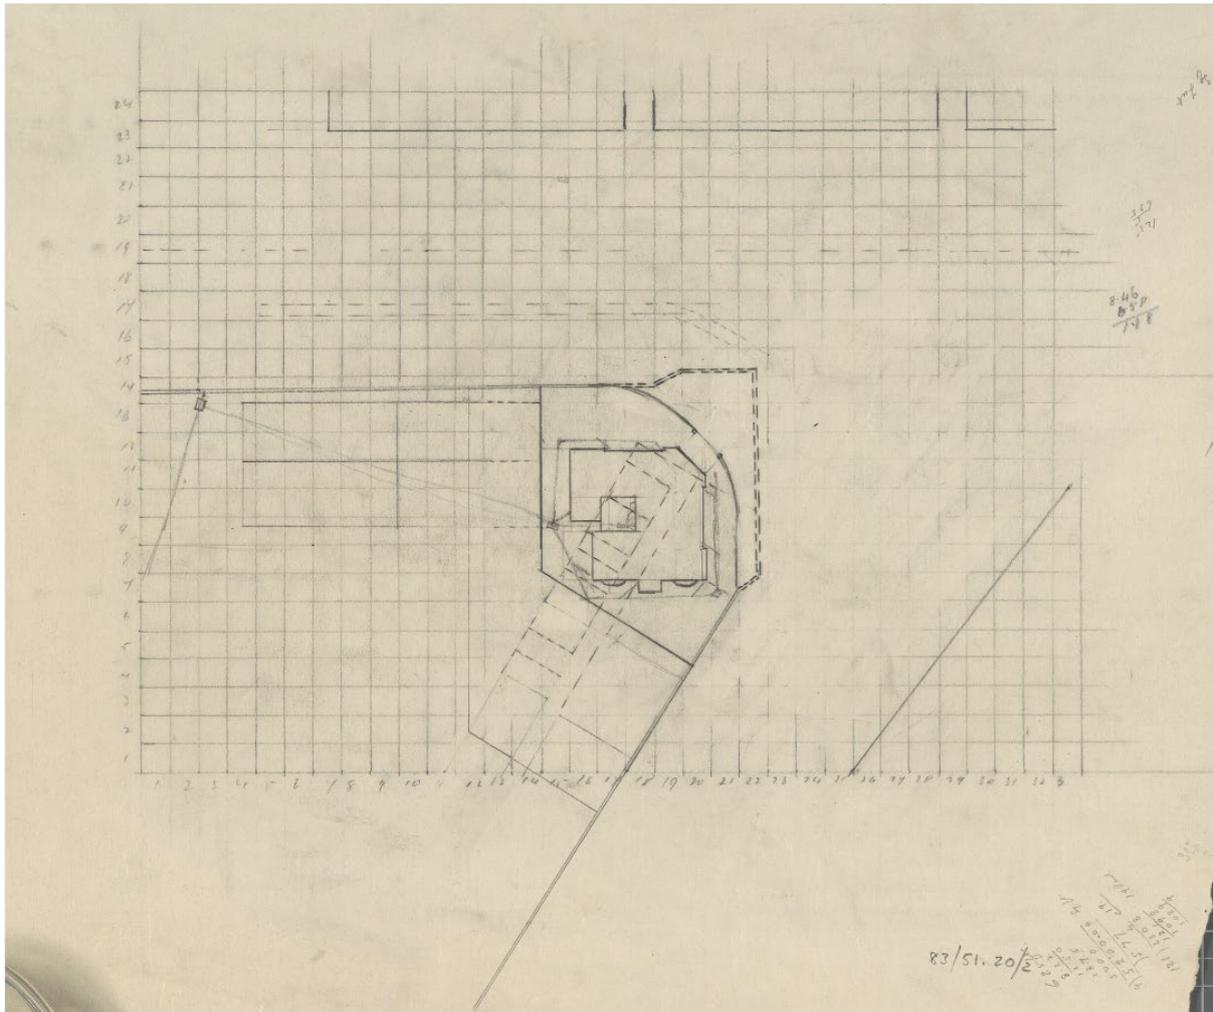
Site plan sketch by Alma Kingsley Sargent, 1934, for New Library at Newbridge (Irish Architectural Archive)
